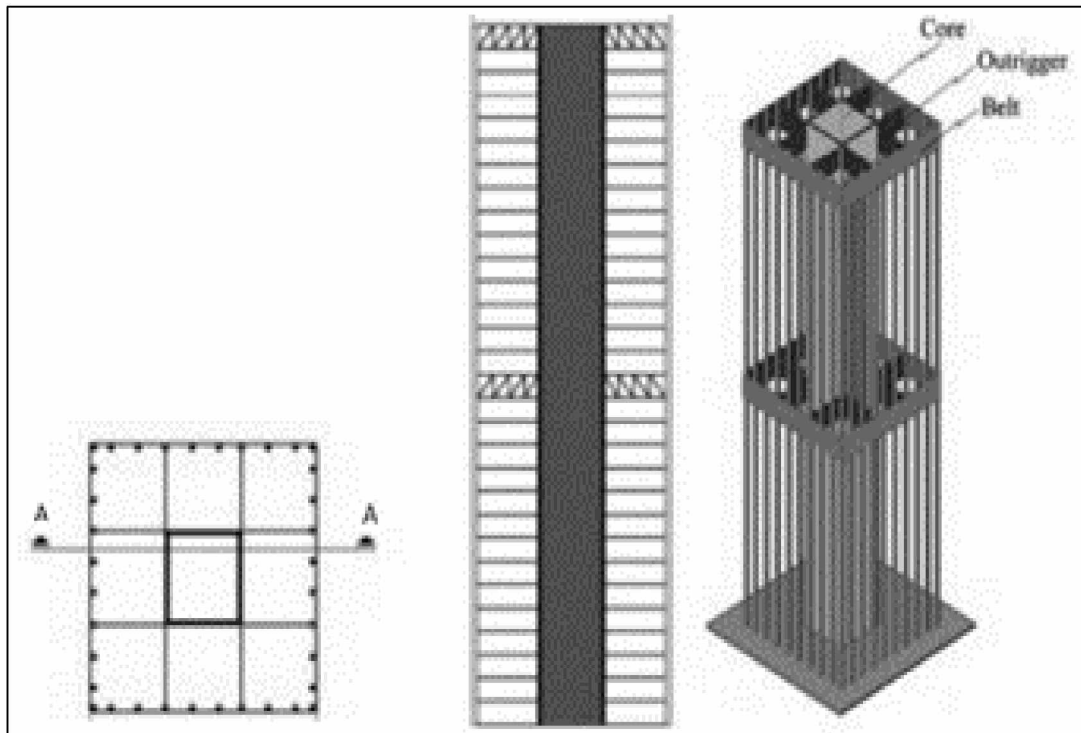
The concept of conventional structural outrigger system in the tall building with central core, outrigger and belt truss (Taranath, 2009)
